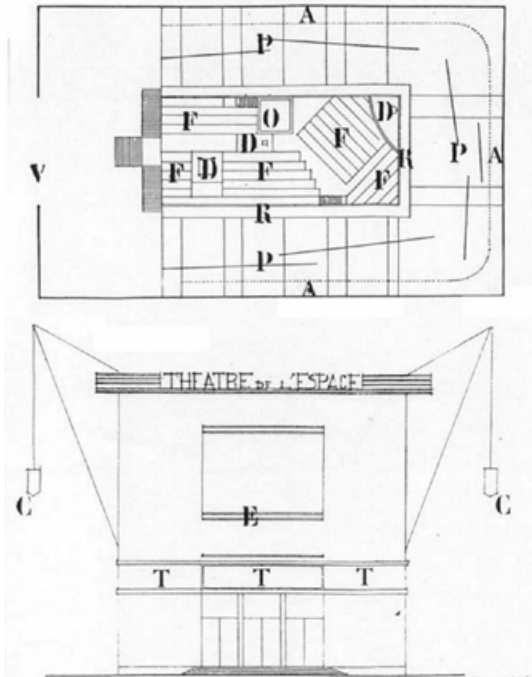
Left: Plan, Section and Elevation drawn by Edouard Autant (Read, 2006).
